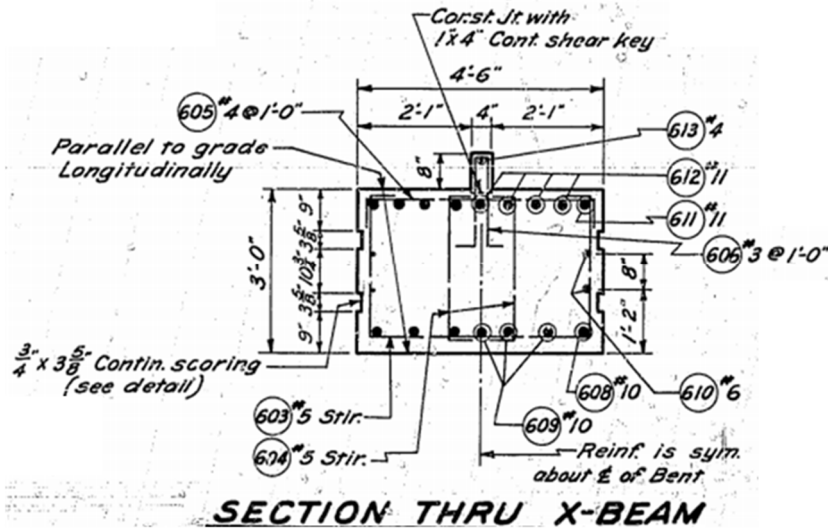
Cap beam cross-section for Typical Bent (Galer-Lakeview)
